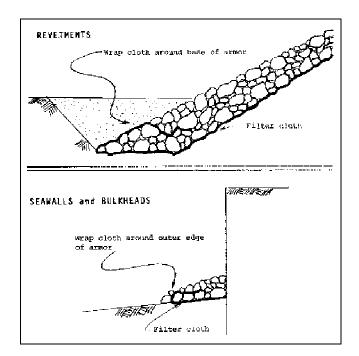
Use of filter cloth under revetment and toe protection stone
